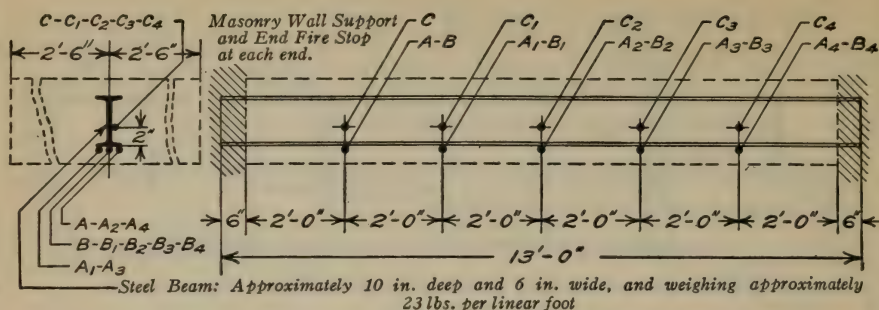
Beam Fireproofing Test for Flush Ceiling
